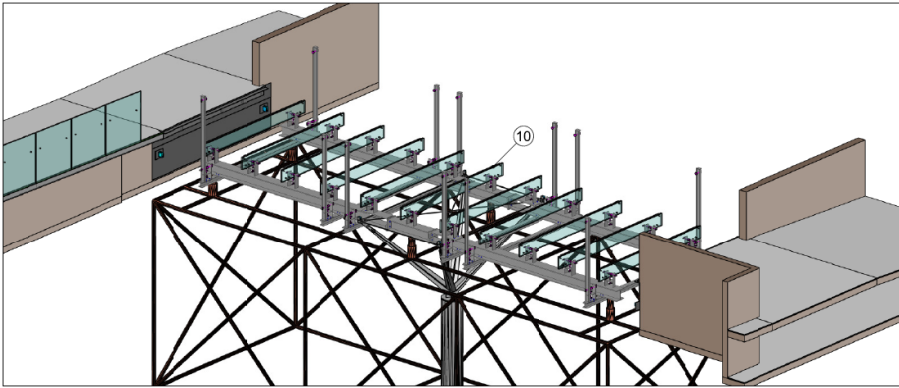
Installation Sequence 10) Installation and adjustment of all glass floor beams
